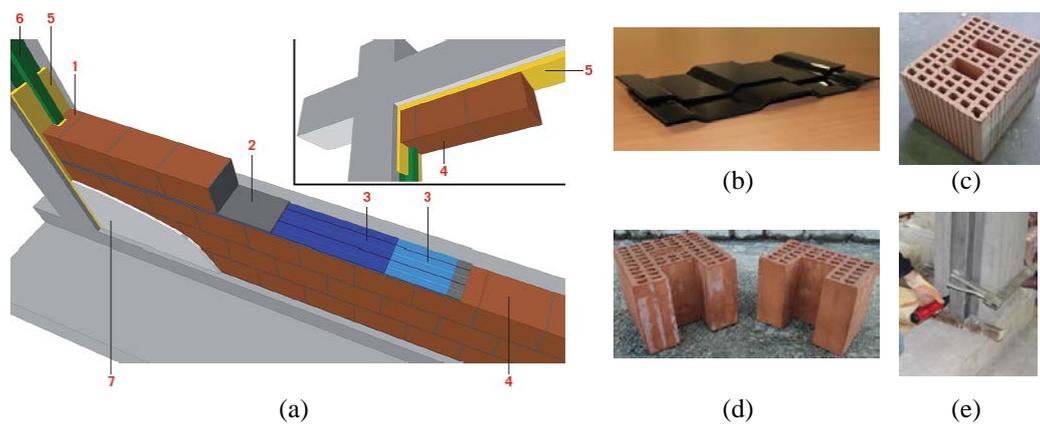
(a) Details of the innovative masonry infill with sliding joints: 1.(c) C-shape units; 2. mortar bed-joints; 3.(b) sliding joints; 4.(d) clay units; 5. interface joints; 6.(e) shear keys; 7. plaster.
